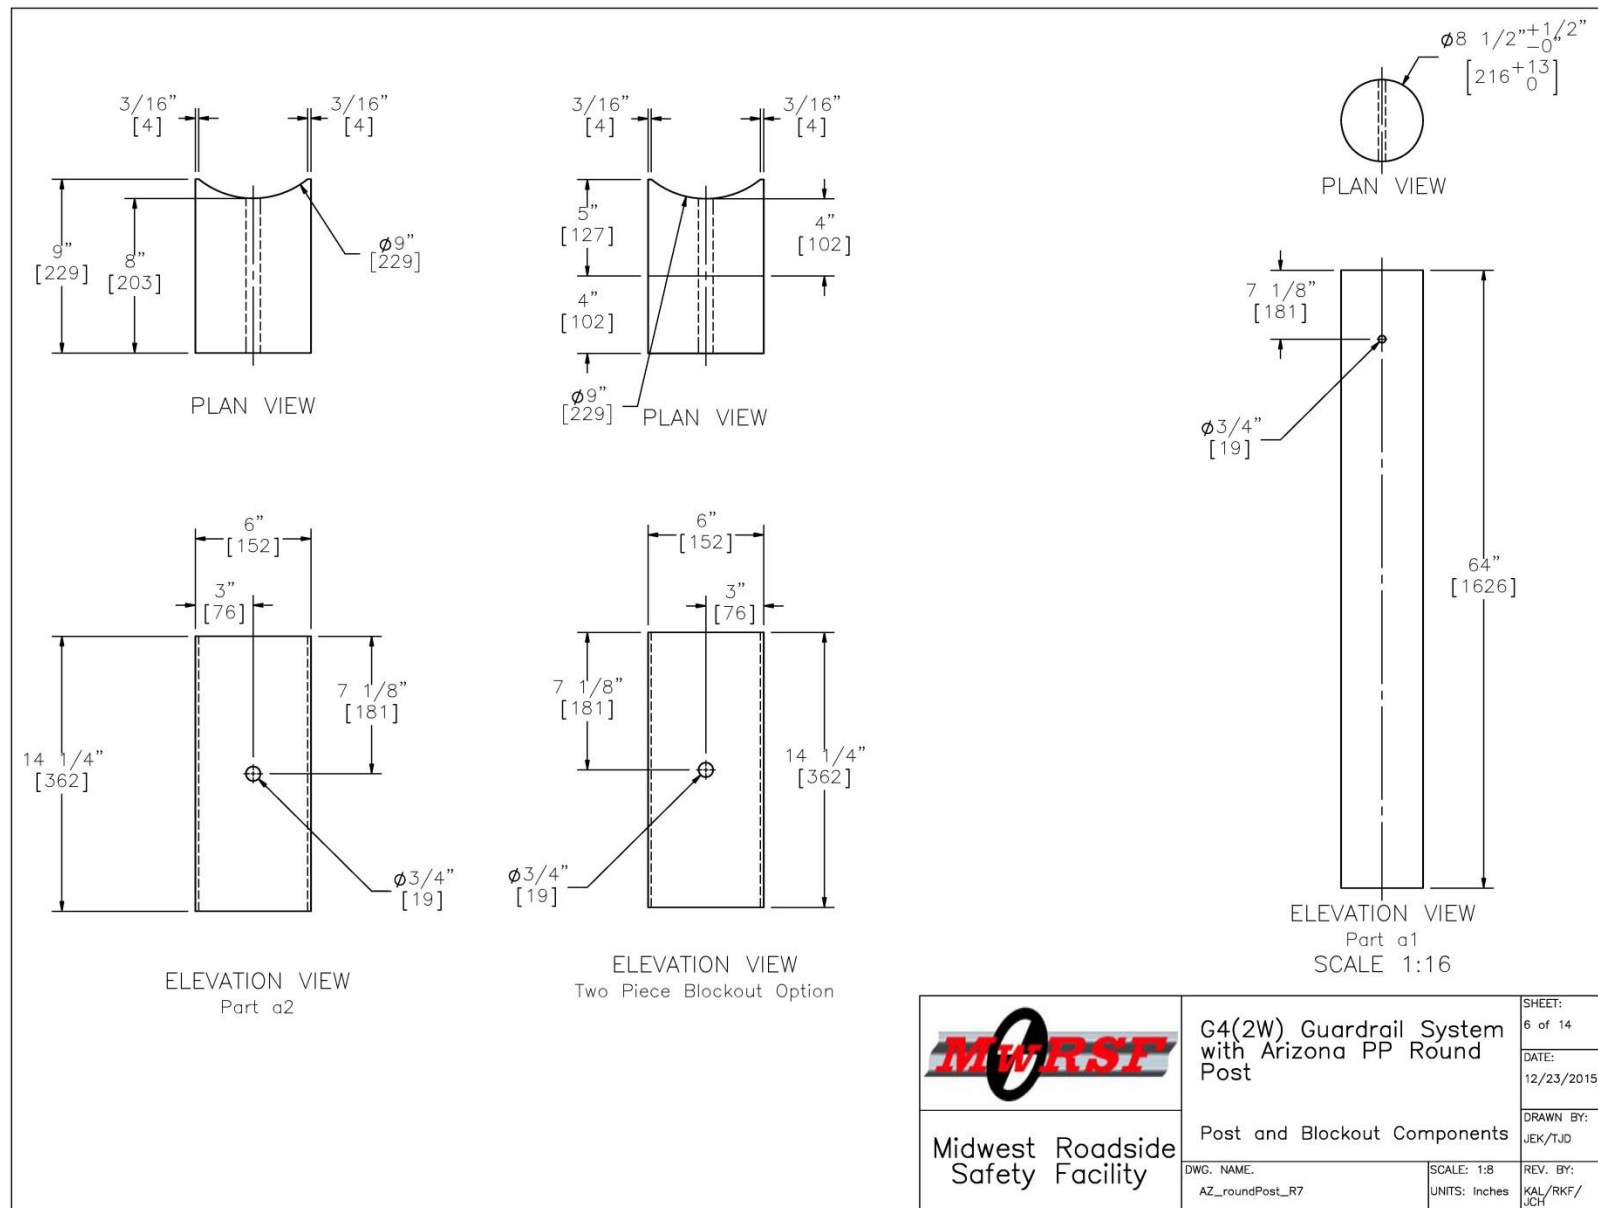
Line Post and Blockout Details, Test No. AZRP-1
